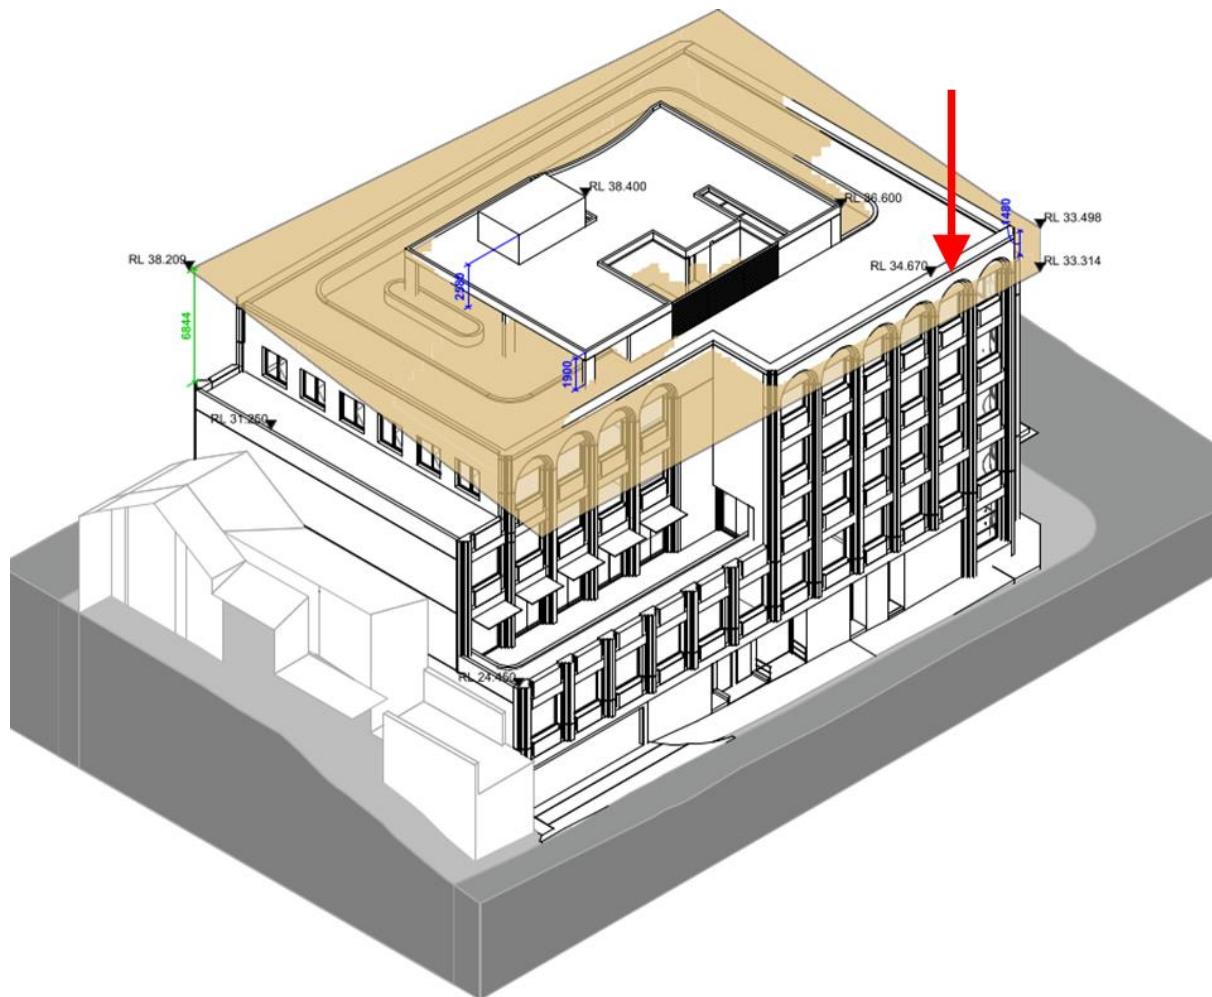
18m LEP height plane with portion of rooftop parapet causing overshadowing to balcony opening of 74-80 Reservoir Street indicated
